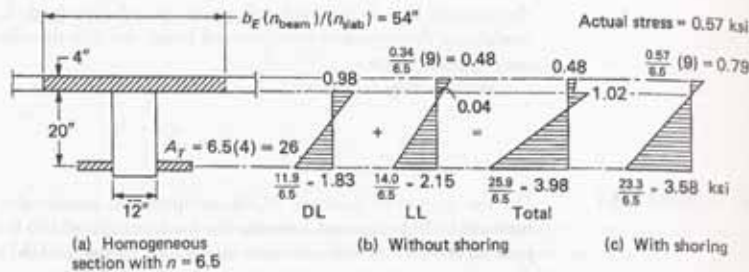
Service load stresses in precast concrete-concrete composite section with and without shoring.
